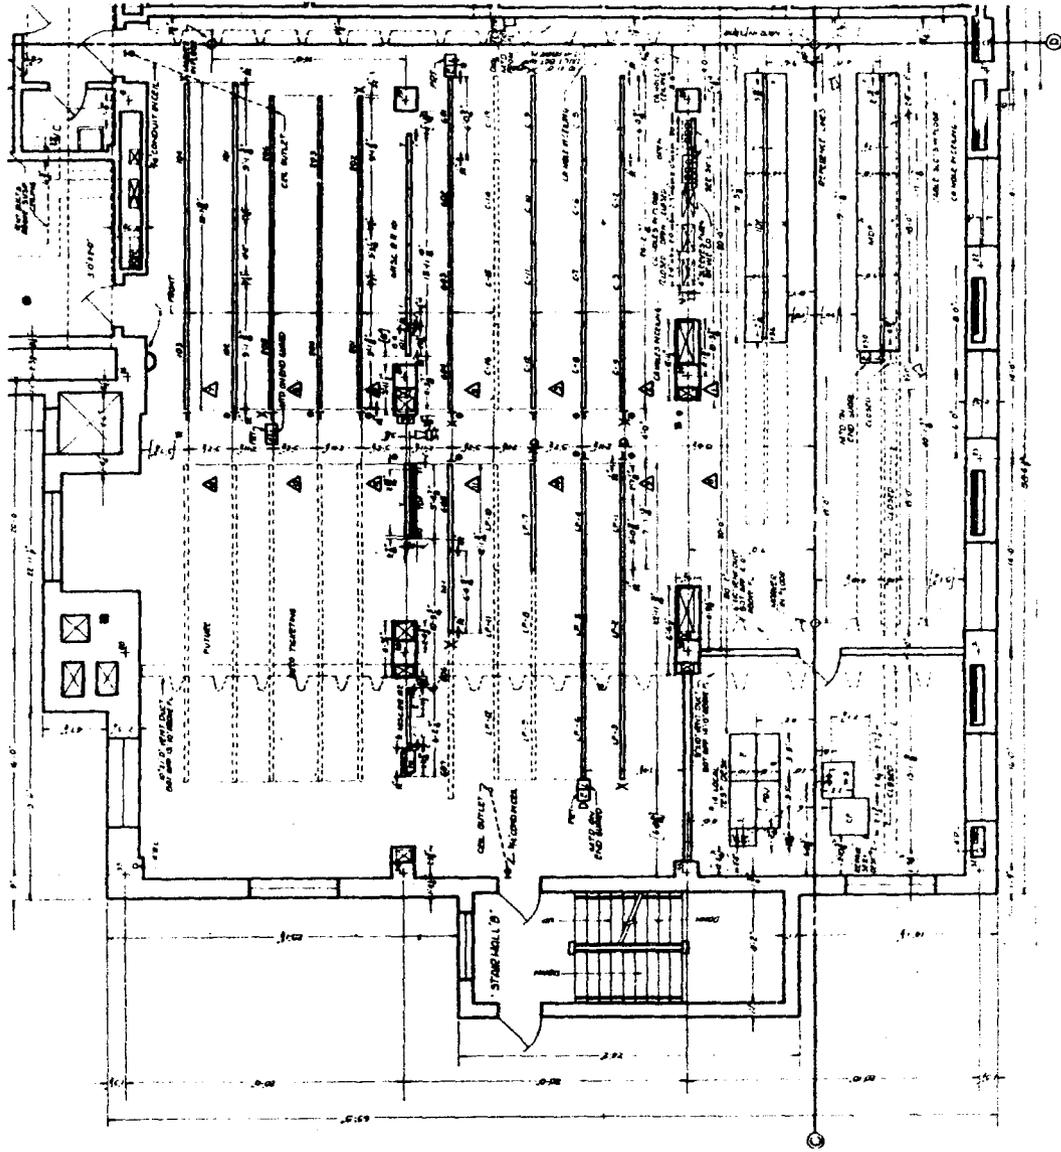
TYPICAL FLOOR PLAN DRAWING
